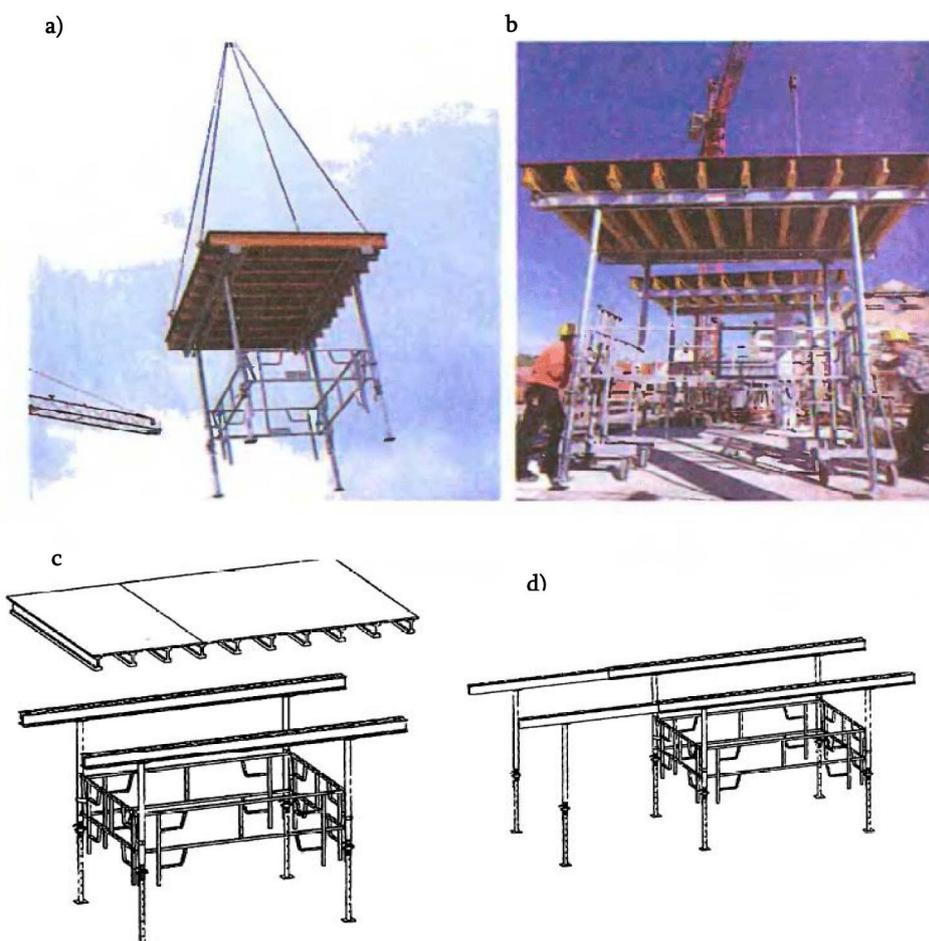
„RASCHAL“ "stellMAX" mold with folding frame: A - mold transportation by crane; b - moving the mold with a cart c - installation and dismantling of the platform; d – mold Extension of the table
